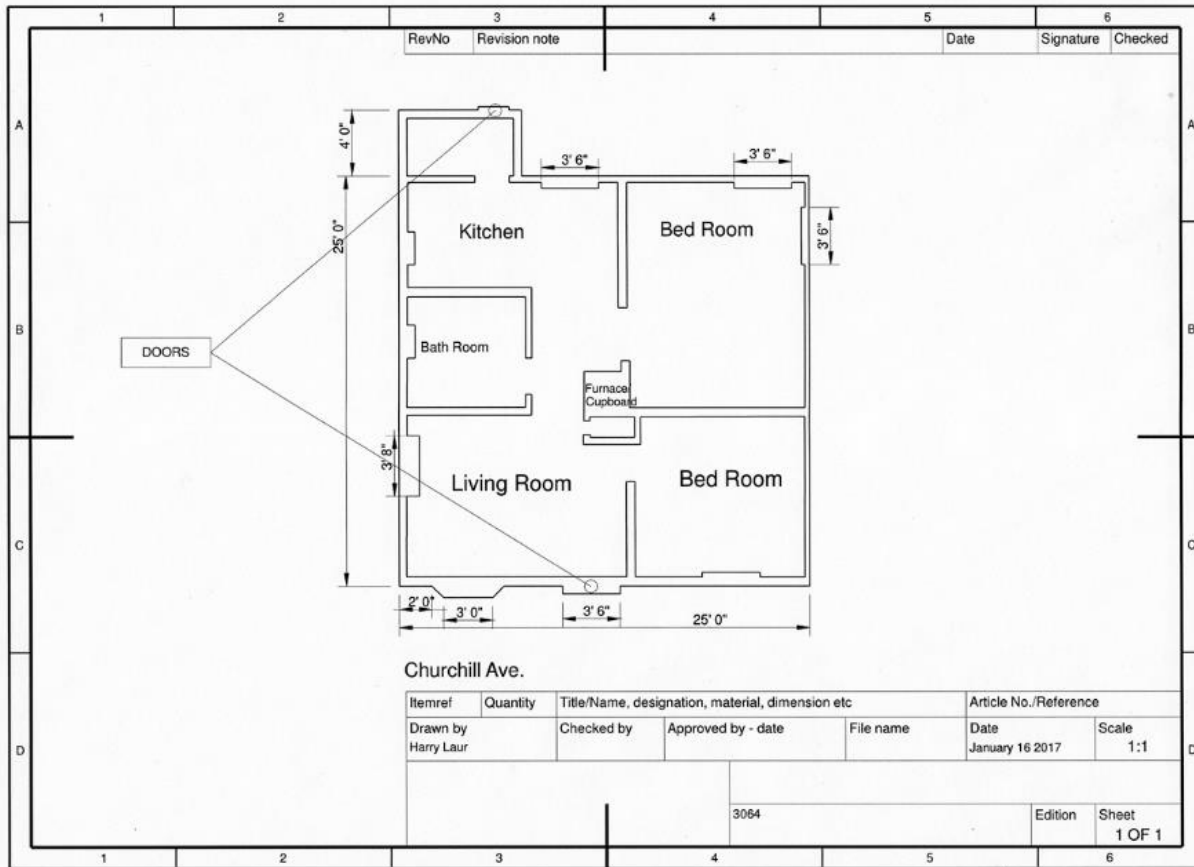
Floor plan, 3064 Churchill Avenue, January 2017
